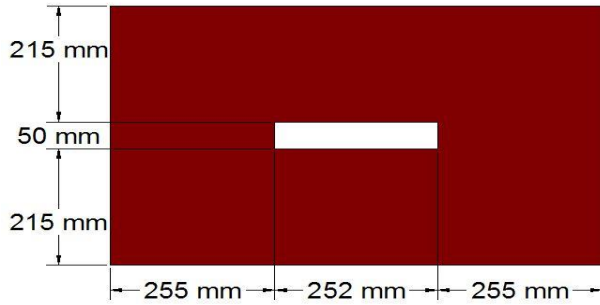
(a) Masonry wall with opening at the center of size 252×50
